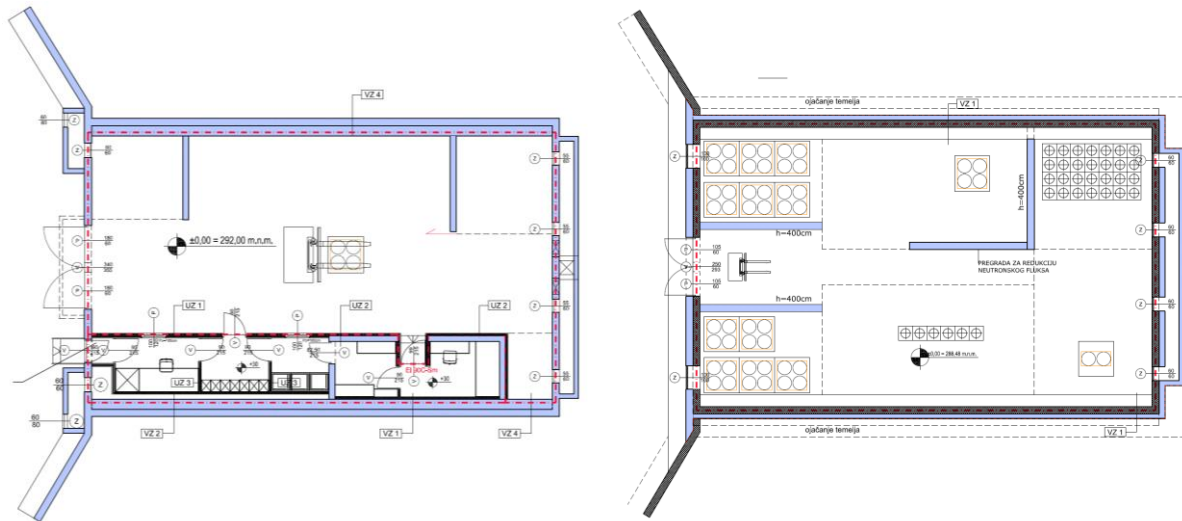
Central Storage layout - Reception Building (left) and Storage Building (right)
